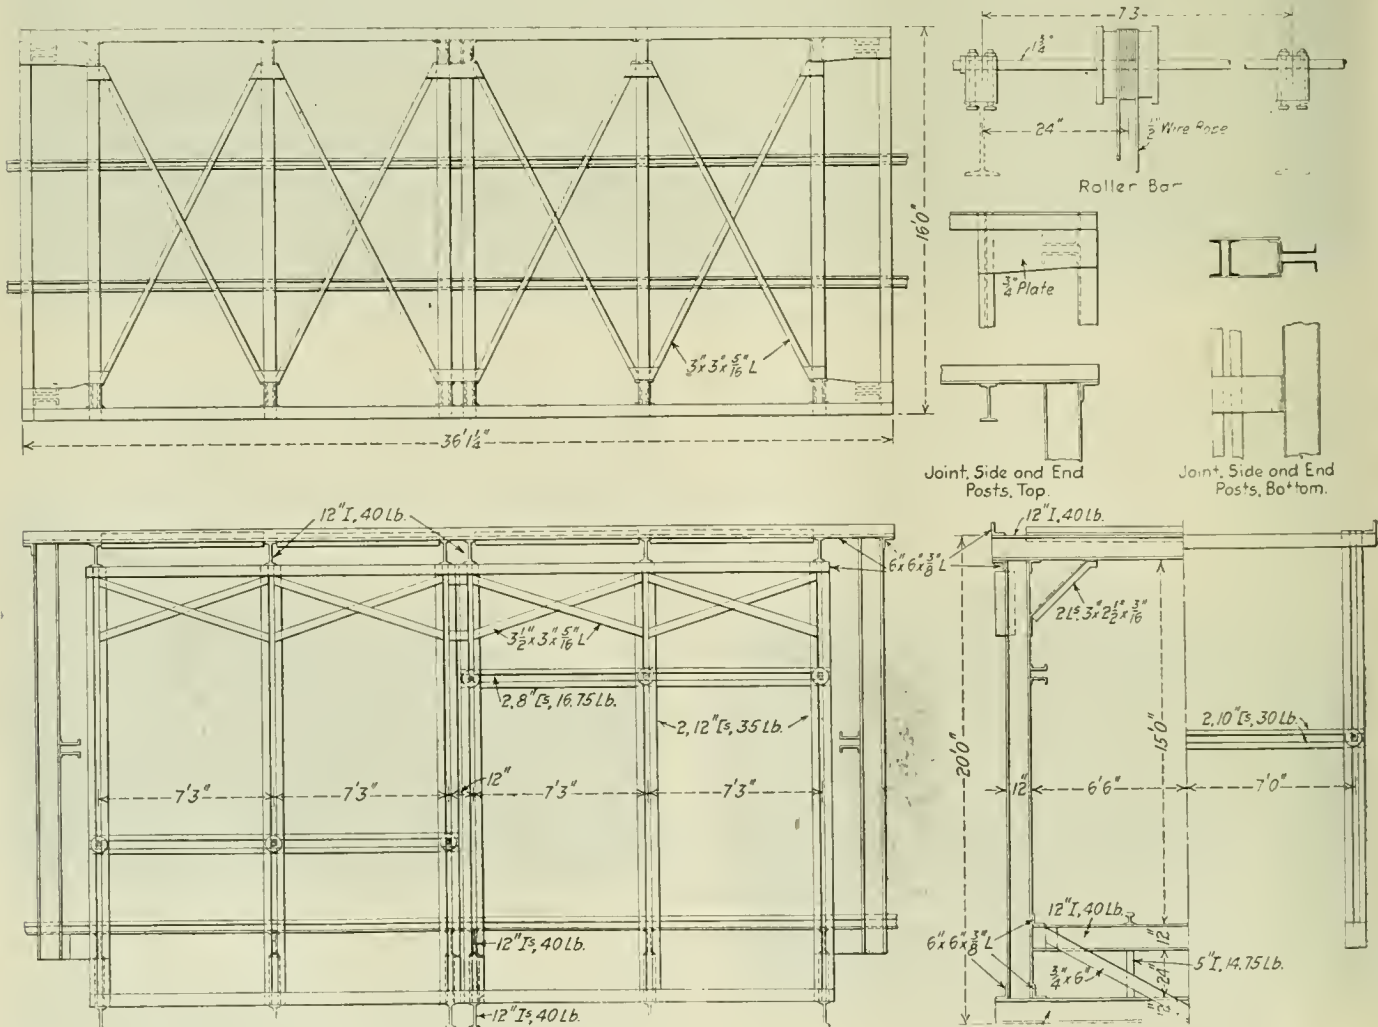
Assembly Drawing of Jacking Stall Showing Arrangement of Structural Steel Parts
